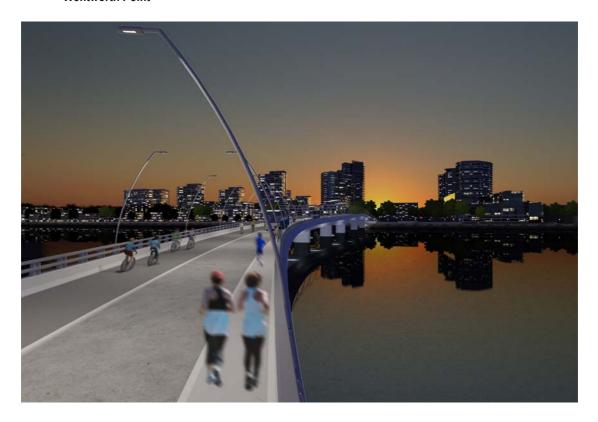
Indicative photo-realistic view of the proposed Homebush Bay Bridge looking east from Wentworth Point over the park towards Rhodes West
